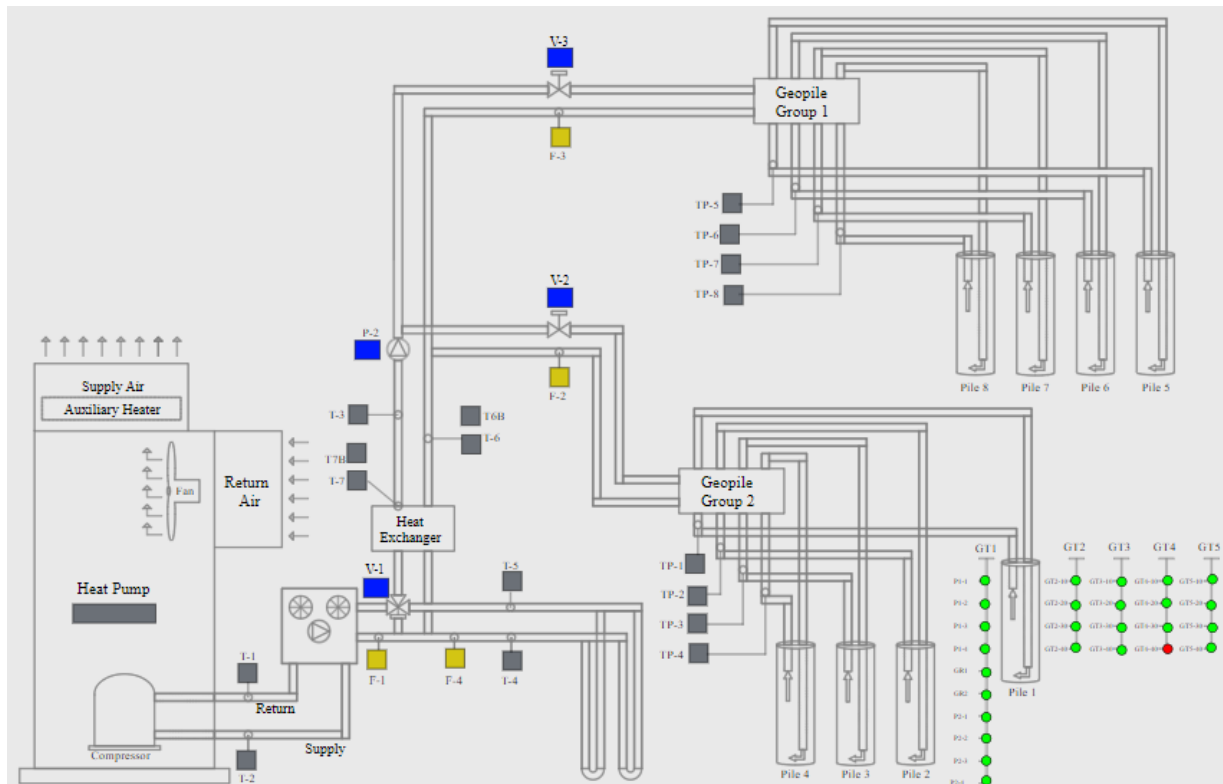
Schematic diagram of the system installed at the Eby Rush TS building
